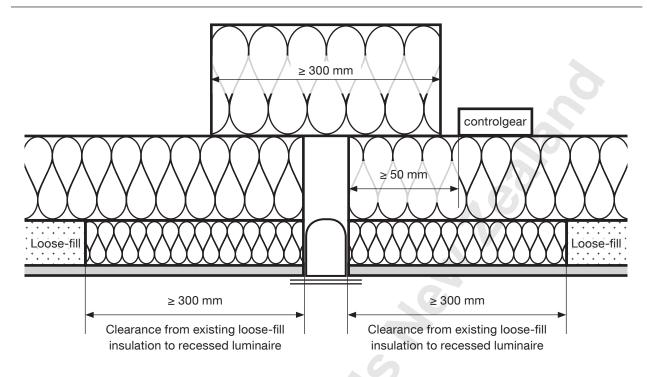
Installing ceiling insulation around recessed luminaires of the type IC, IC-F, and IC-4 where the luminaire manufacturer's instructions are not known (ceilings with existing loose-fill insulation)
